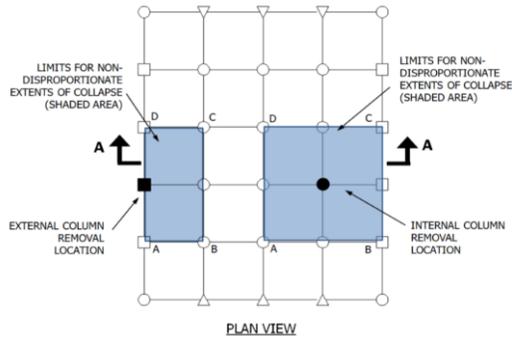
Allowable Extents of Collapse for Interior and Exterior Column Removal in Plan
